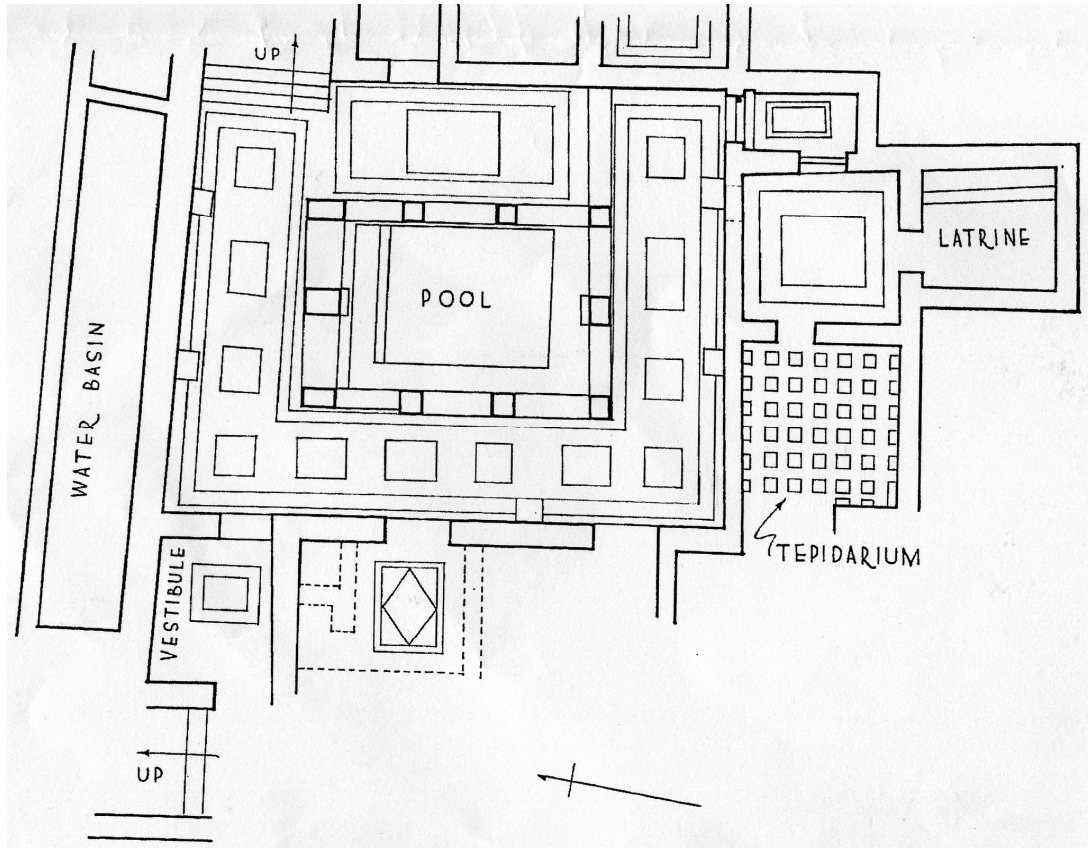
Plan of the Jekmejev bathhouse, near Antioch. Scale 1:200 [Stillwell 1941, plan 6].
